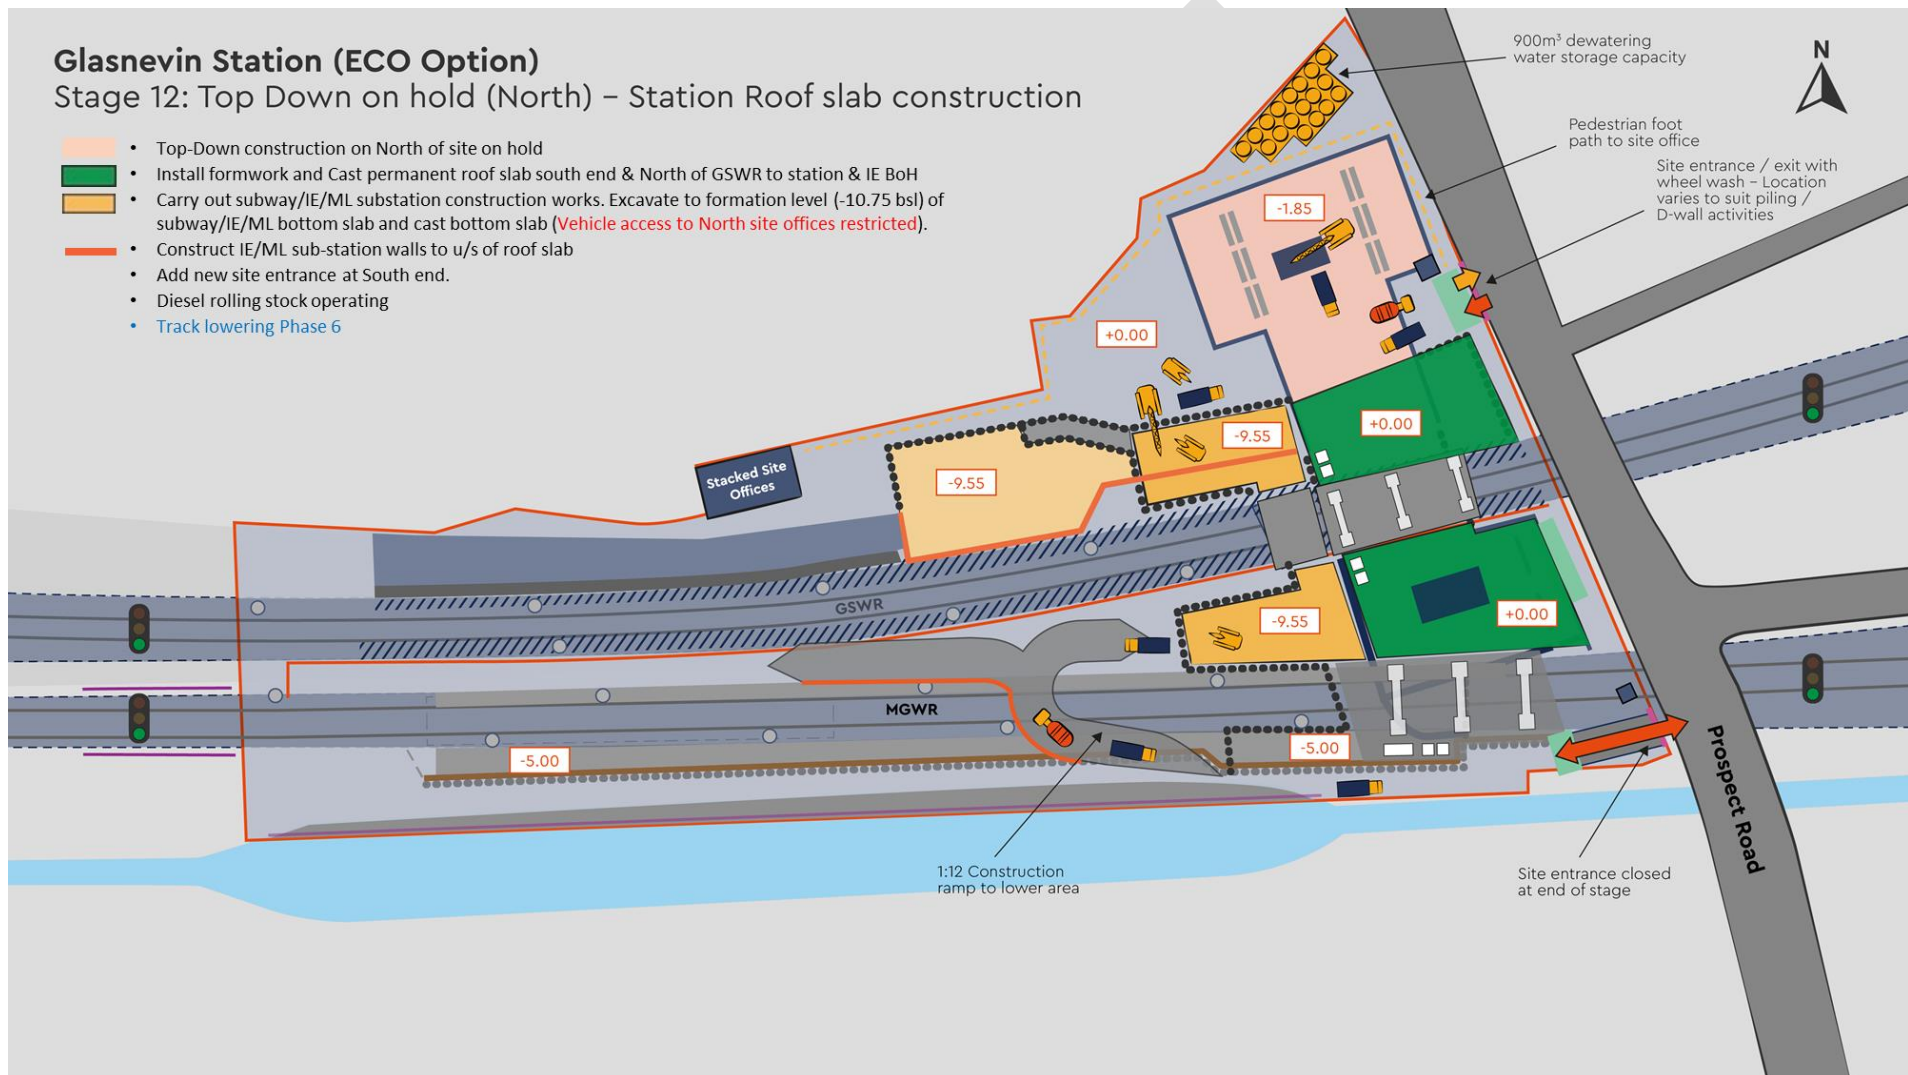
Glasnevin Station - Stage 12 Top Down on Hold (North) - Station Roof Slab Construction
